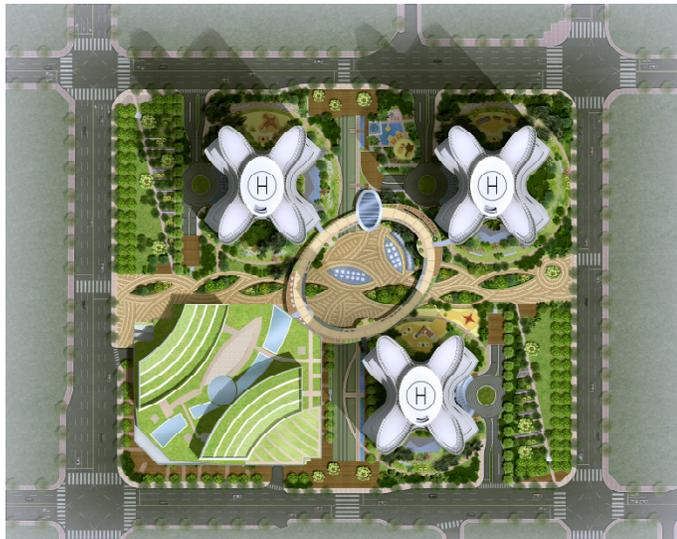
Site Plan (Courtesy of De Stefano Partners)
